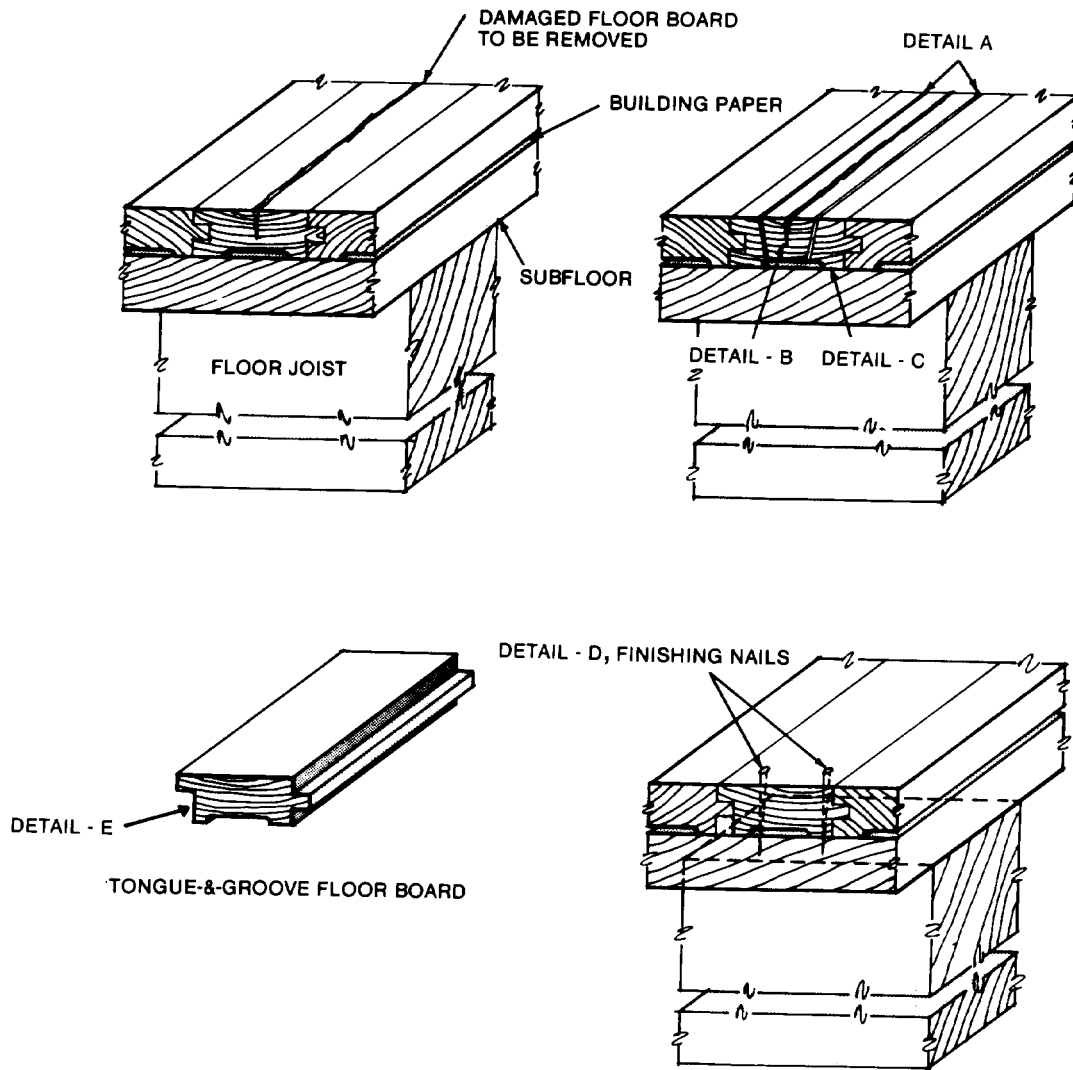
METHOD OF REPLACING TONGUE-AND-GROOVE FLOORING.
